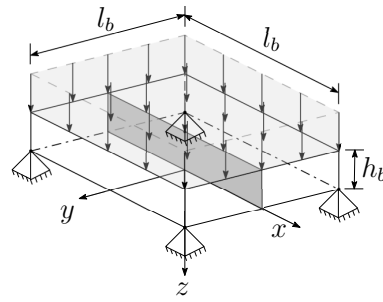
Central plane of a supported structure submitted to a vertical load
